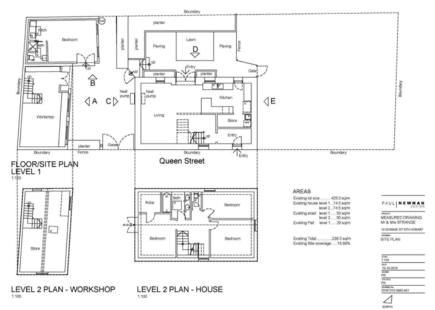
Existing Floor Plan for Bakery and Workshop (www.realestate.com.au, 2019)
